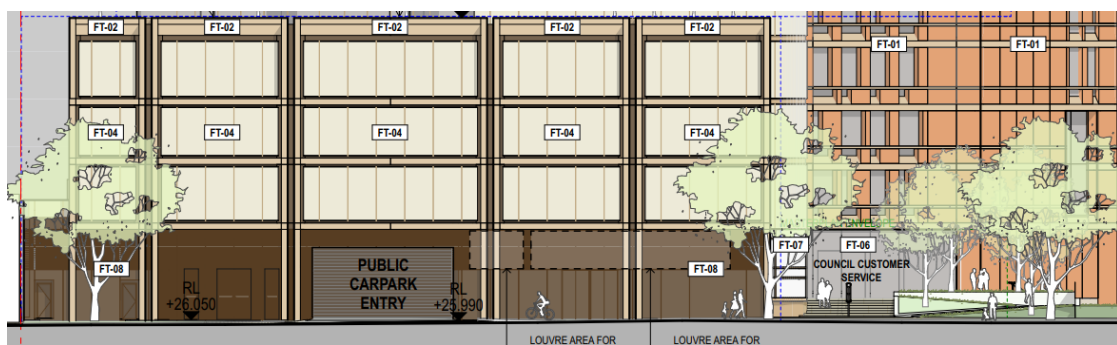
Terminus Street Elevation showing the architectural treatment of service rooms
